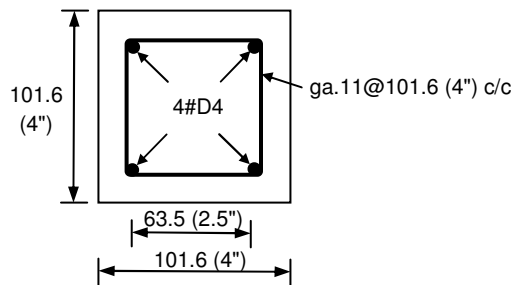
Typical column reinforcement details for the model structure tested on shake table by Bracci et al (1992, 1995)
